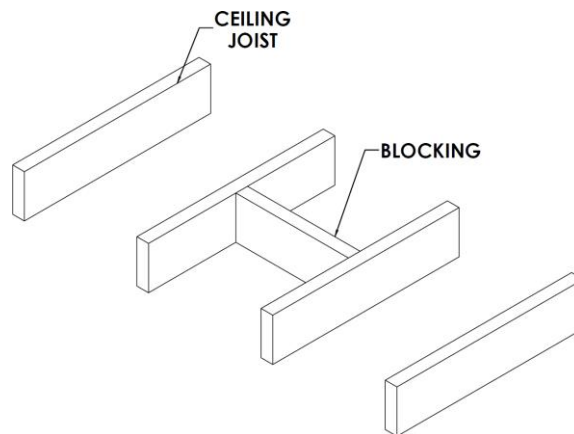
Wood Blocking Positioned Between Ceiling Joists
